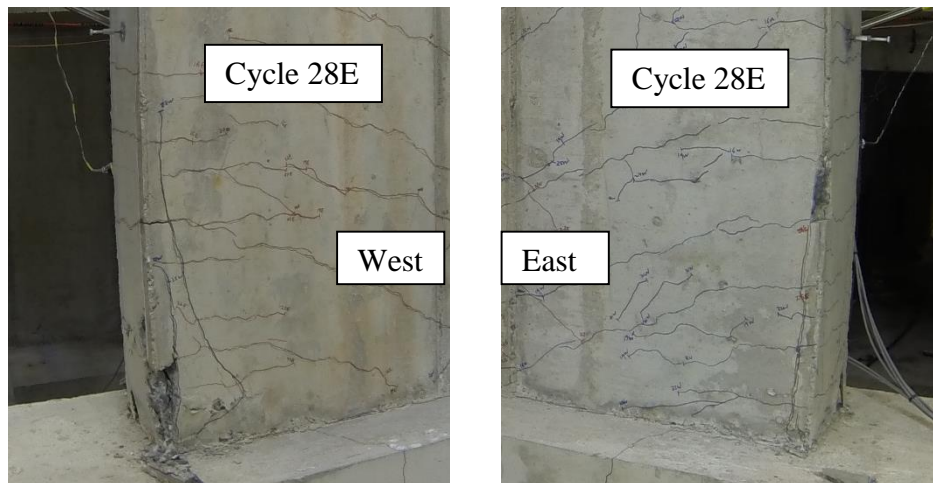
Photographs of observed concrete spalling Wall 2
